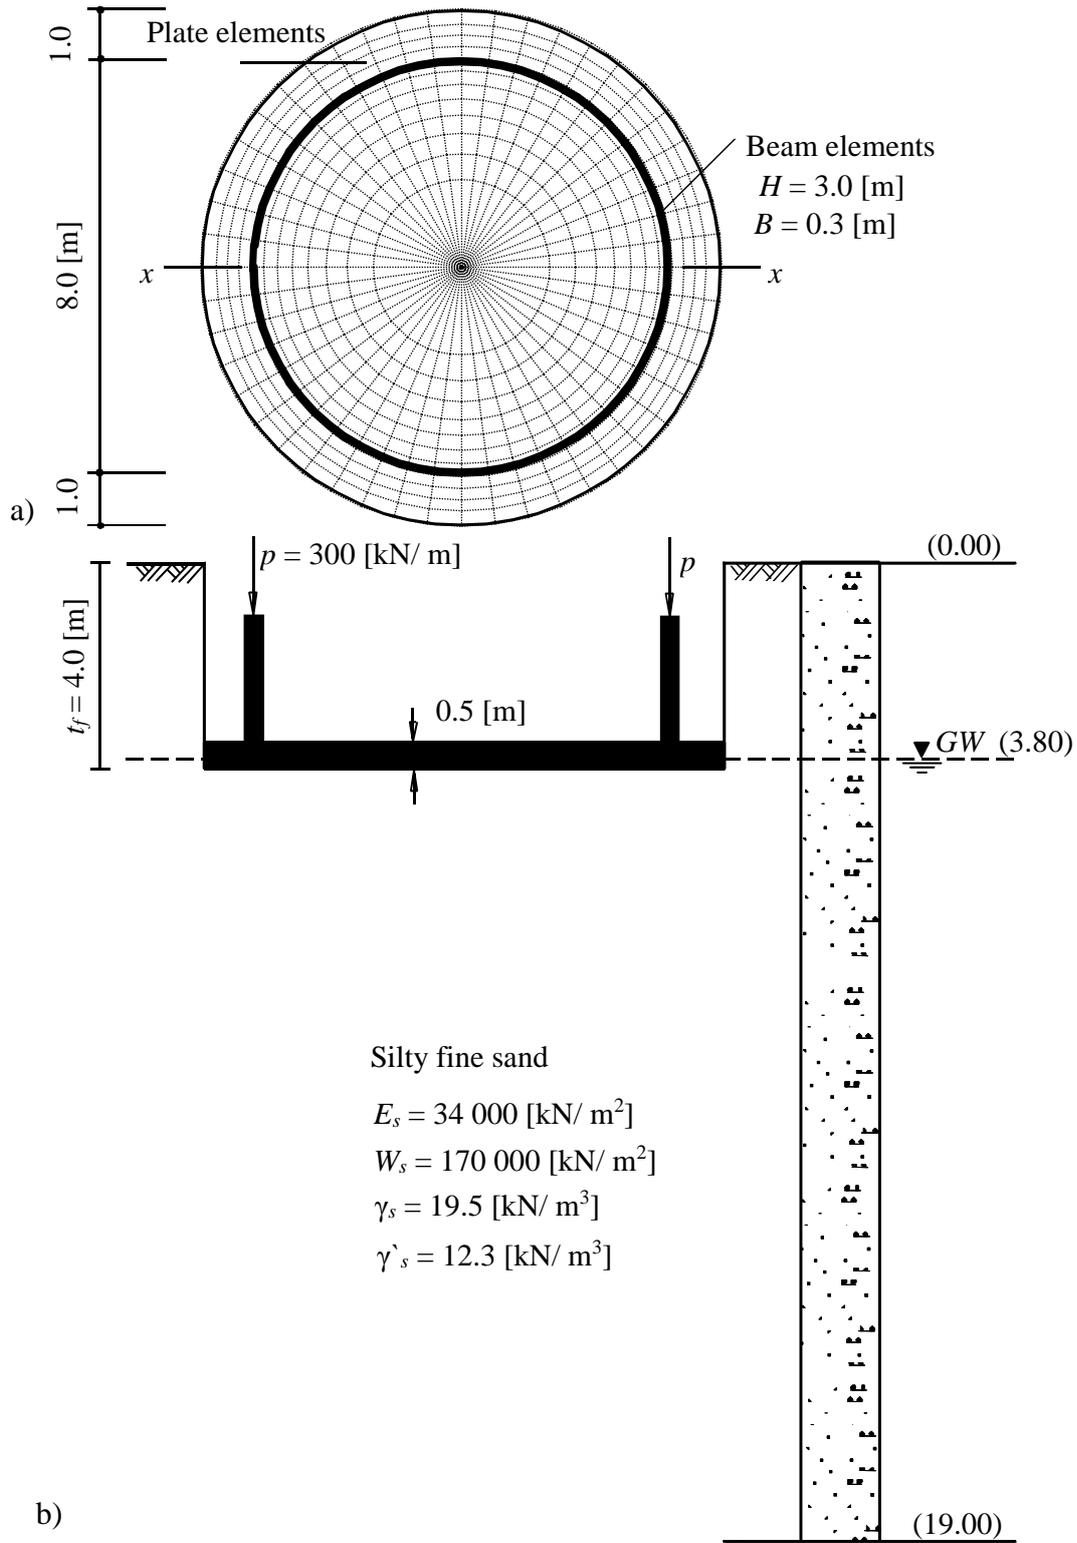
a) Plan of the raft with wall load, dimensions and mesh
